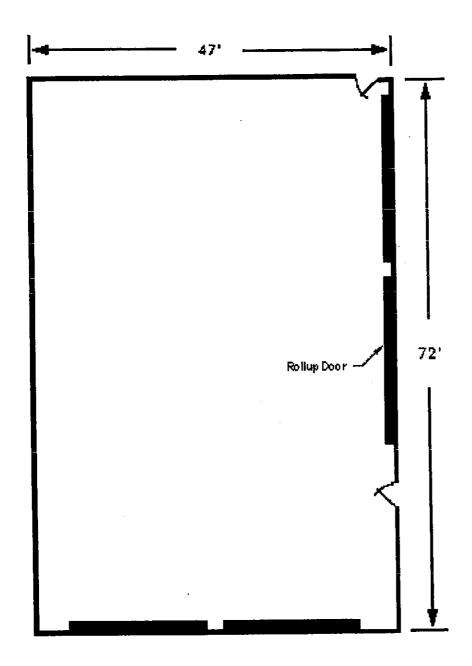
SWSA 6 Waste Storage Facility, Building 7842.
